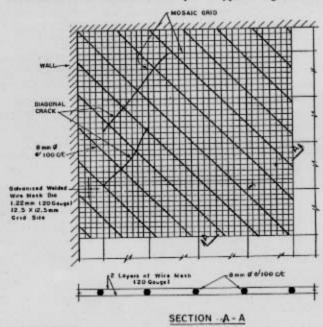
Typical arrangement of reinforcement for diagonal crack repair
